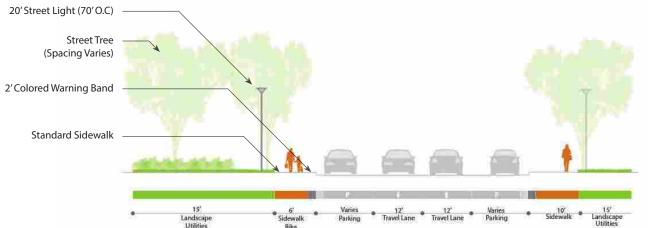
Proposed section of (West) Ridgedale Drive (typical)
